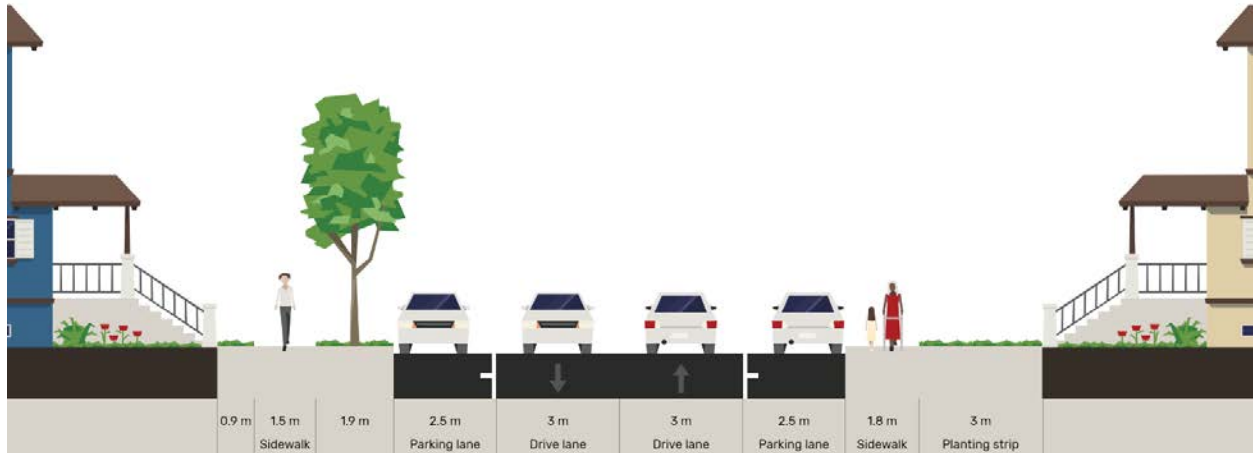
Current Cross-Section of Alma St (North of West Fourth Ave)
